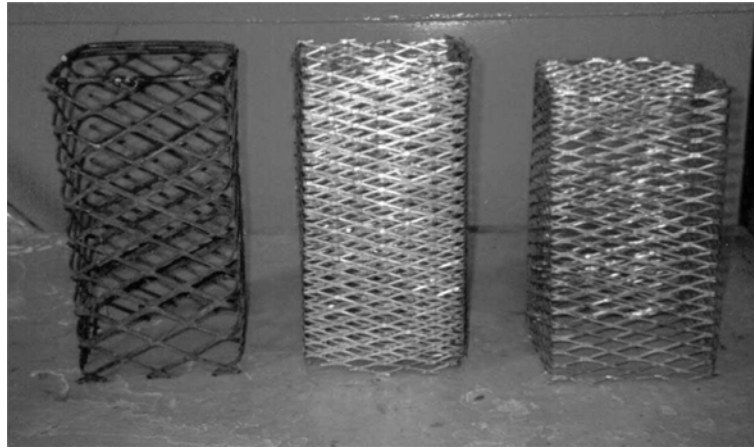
Prepared expanded steel meshes for retrofitting column specimens
